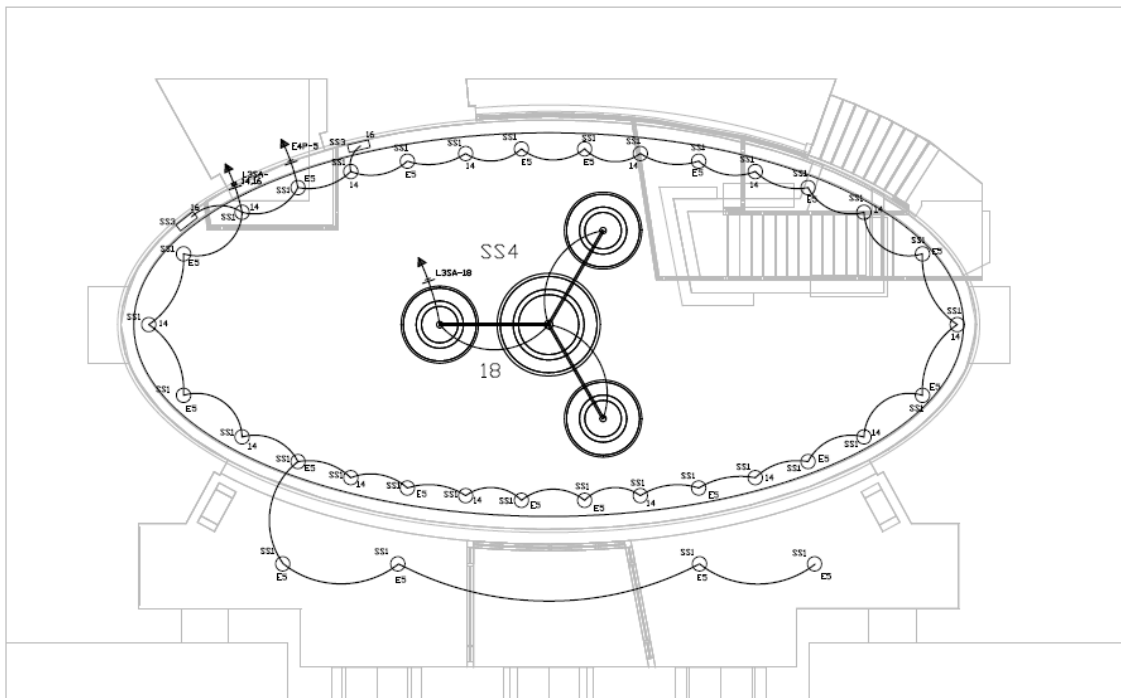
Third Floor Circuiting Plan – Atrium
